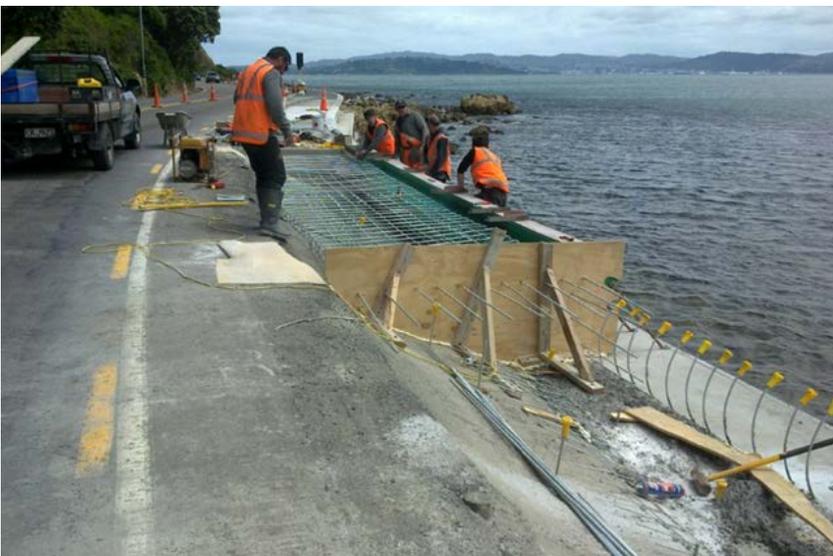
In situ concrete pouring using shape formers (upper section)
